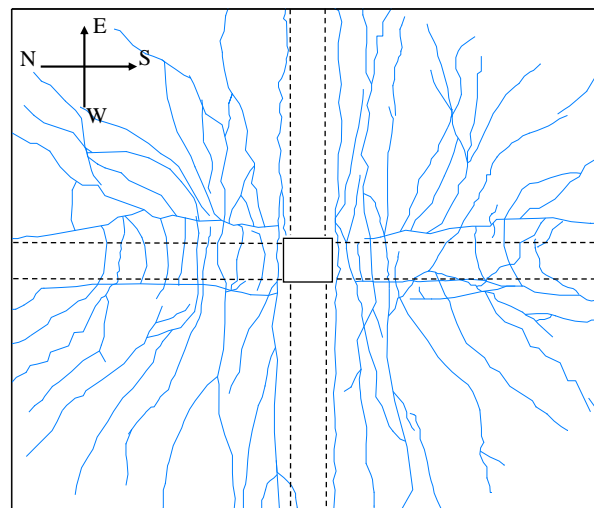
Cracking patterns on the top of slab for Specimen 3SA at 2% drift.
